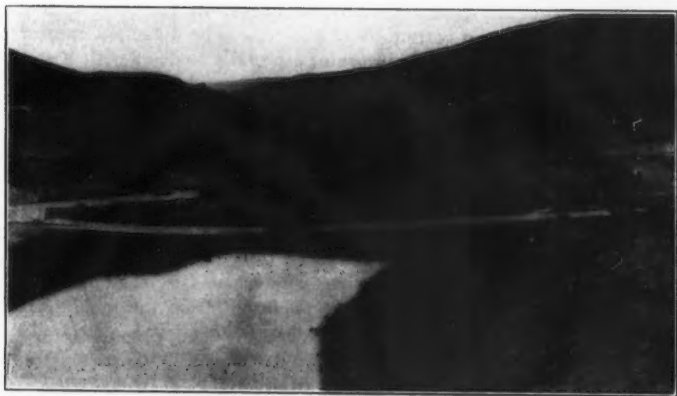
A SMALL OVERFLOW DAM. SHOWING OBSTRUCTION IN THE MIDDLE TO
